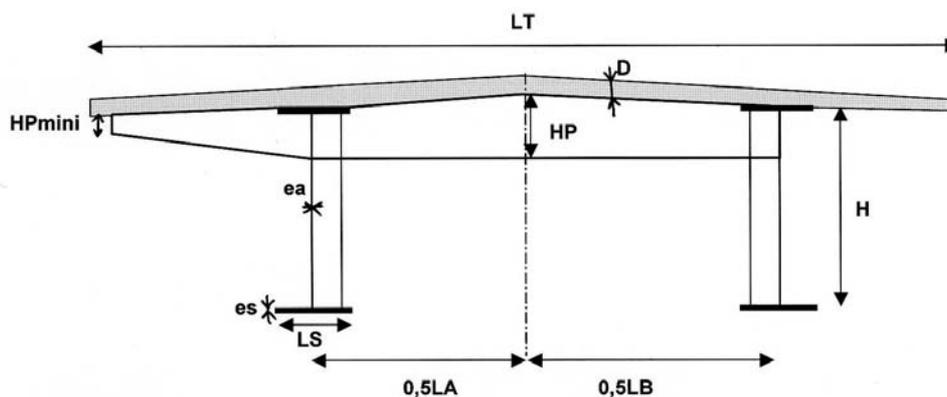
Design parameters for a twin girder directly supporting cross-beam composite bridge (with cantilevers at left, without cantilevers at right)
